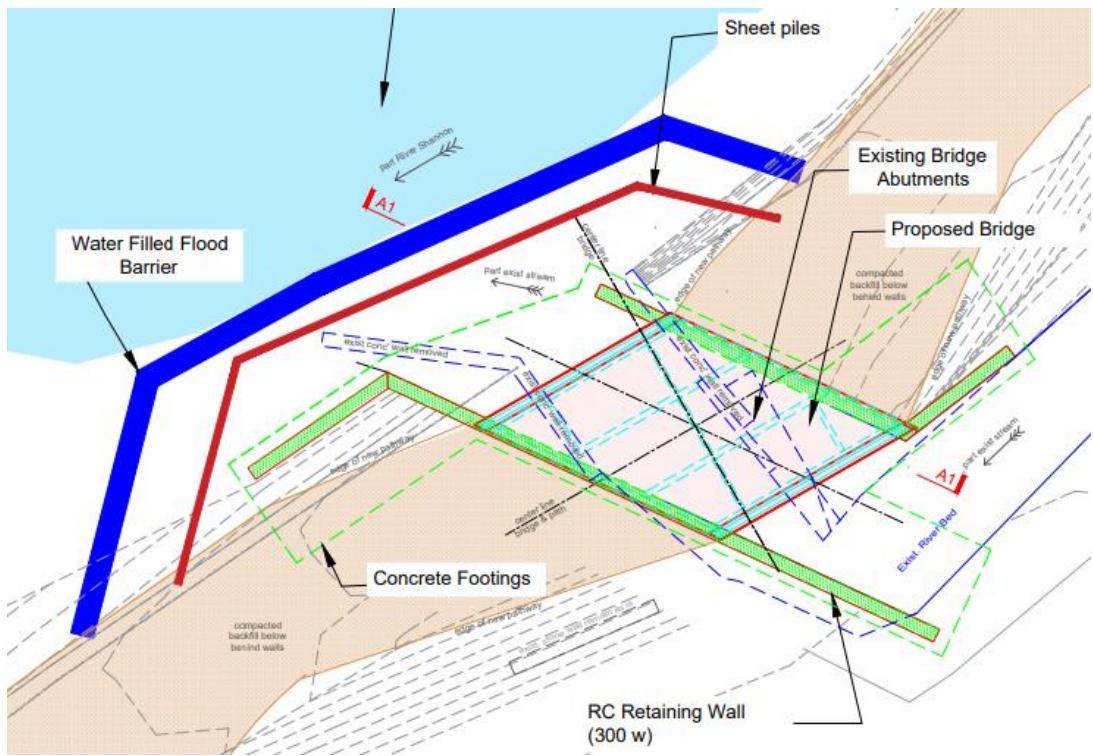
Proposed plan of Bridge 1, with ecology protection measures (refer to drawing RHA-XX-DR-S-SP0012)
